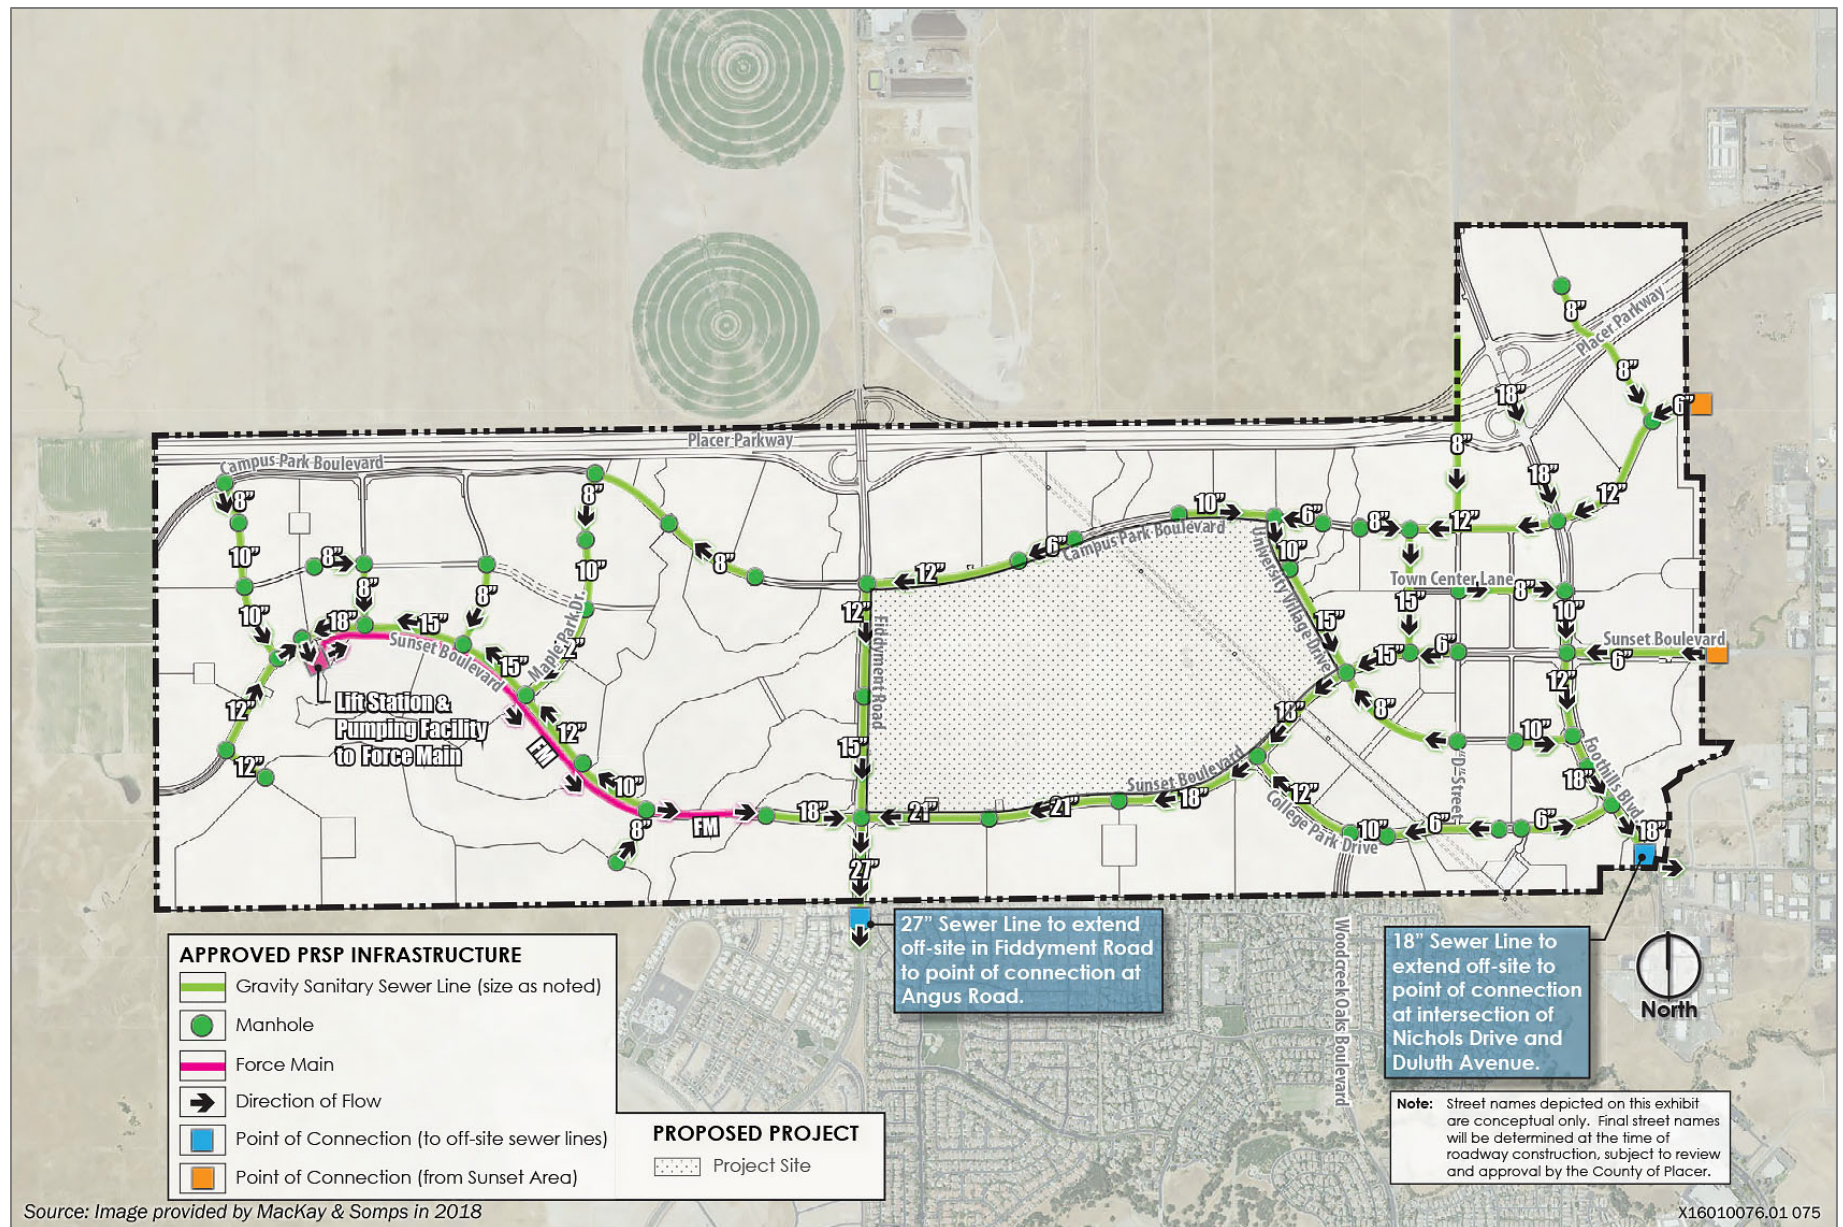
Placer Ranch Specific Plan Wastewater
